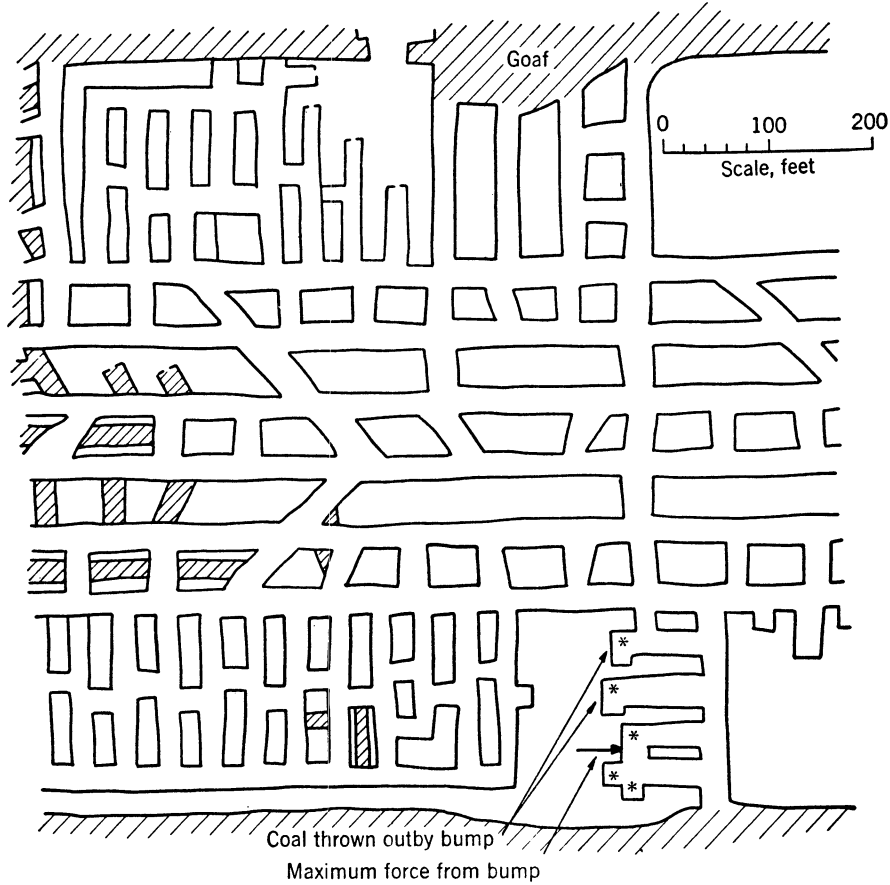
Bump in an Extraction Area; a Large Pillar Was Being "Honeycombed" in an Abutment Area.
